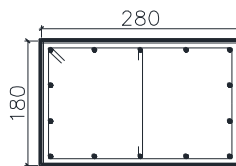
Reinforcement design of the bridge piers (unit: mm)
